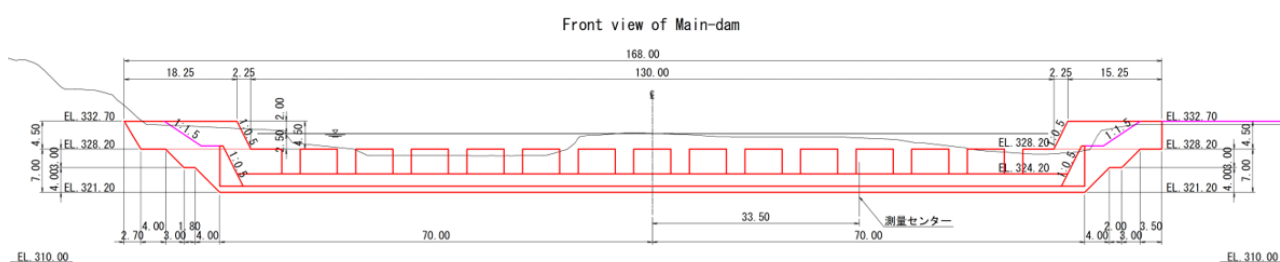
Drawing of sabo dam (open-type (slit type) (Front view of KD Leprak3)
